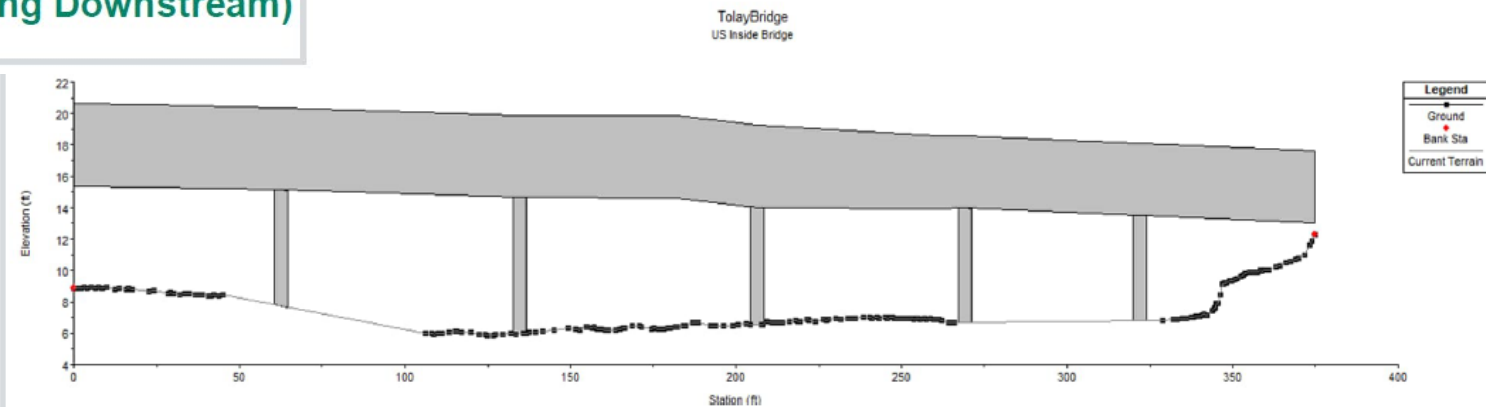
Tolay Creek Bridge (Proposed Condition, Looking Downstream)
